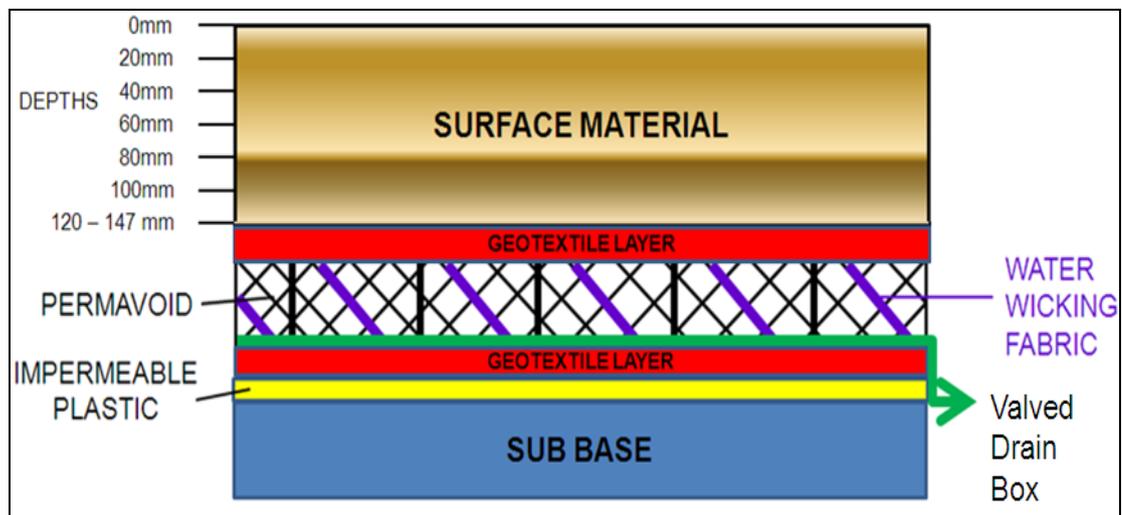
Component layers of the test track at Myerscough College. Picture courtesy of Jessica Hawkins, and UCLAN.
